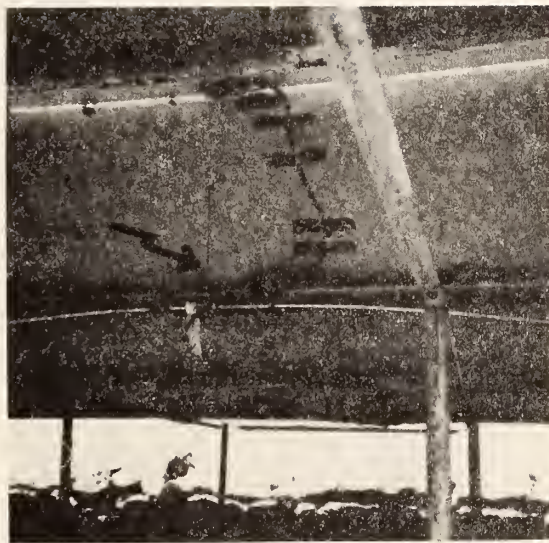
FAILURE OF INTERIOR GIRDER AT
